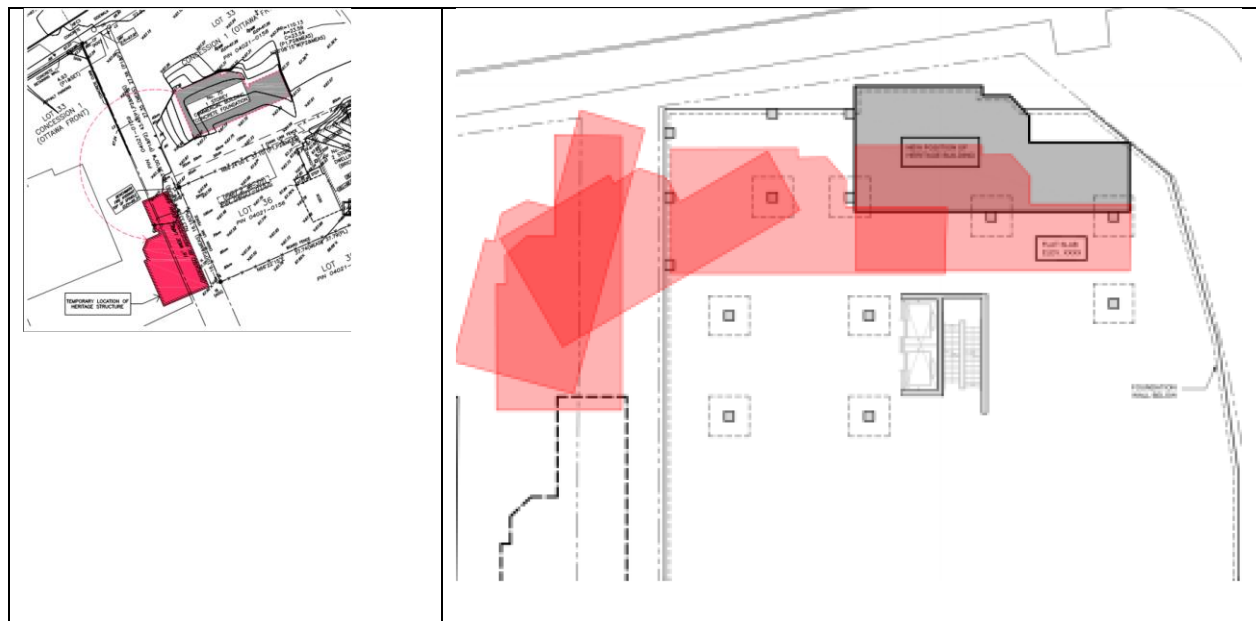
Plans illustrating the original location of the Champlain Oil Company Service Station, it is located just off the site during construction and its proposed location as shown on the site plan at the intersection. The approach is to move the entire structure (house-form commercial section, the adjoining office area, and the two-bay service garage.) Source: Hobin Architecture 2021.
